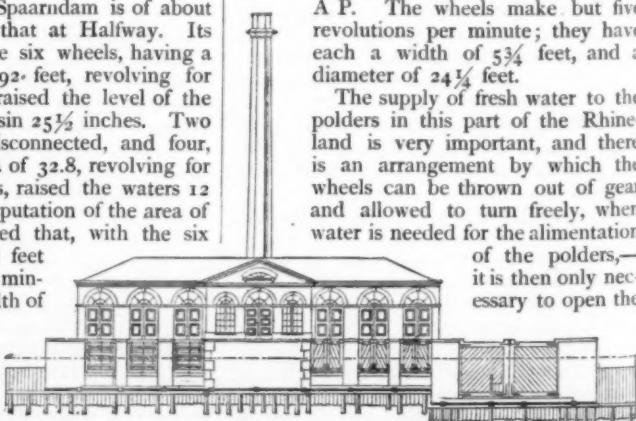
ELEVATION OF STEAM WORKS AT HALFWAY.
